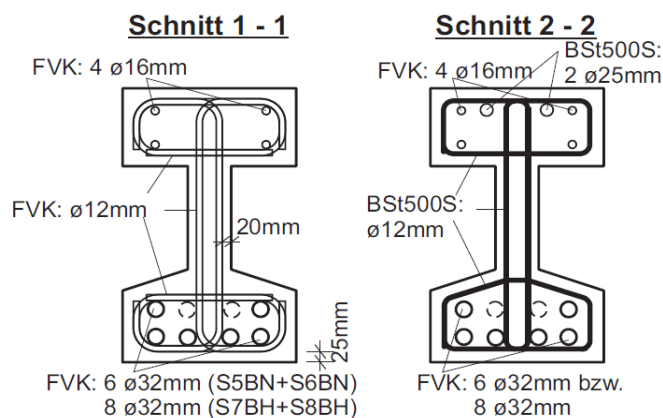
Beam cross-sections for test beam: S6BN-0.8-11(Kurth 2012)
